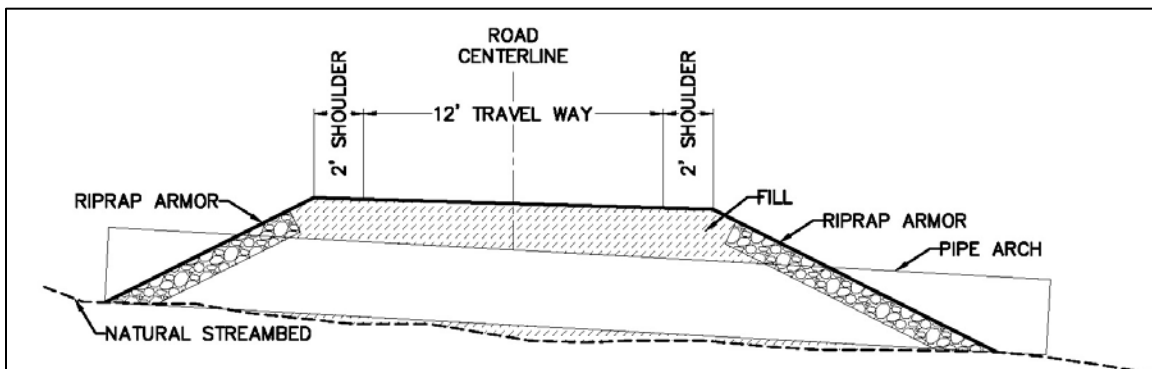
Typical design for pipe arch (squash pipe) with armor.
